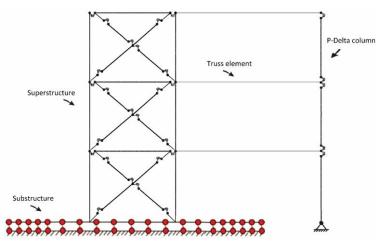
OpenSEES model of structure-foundation-soil system (adapted from Aguero (2006) and Prishati (2008)).
